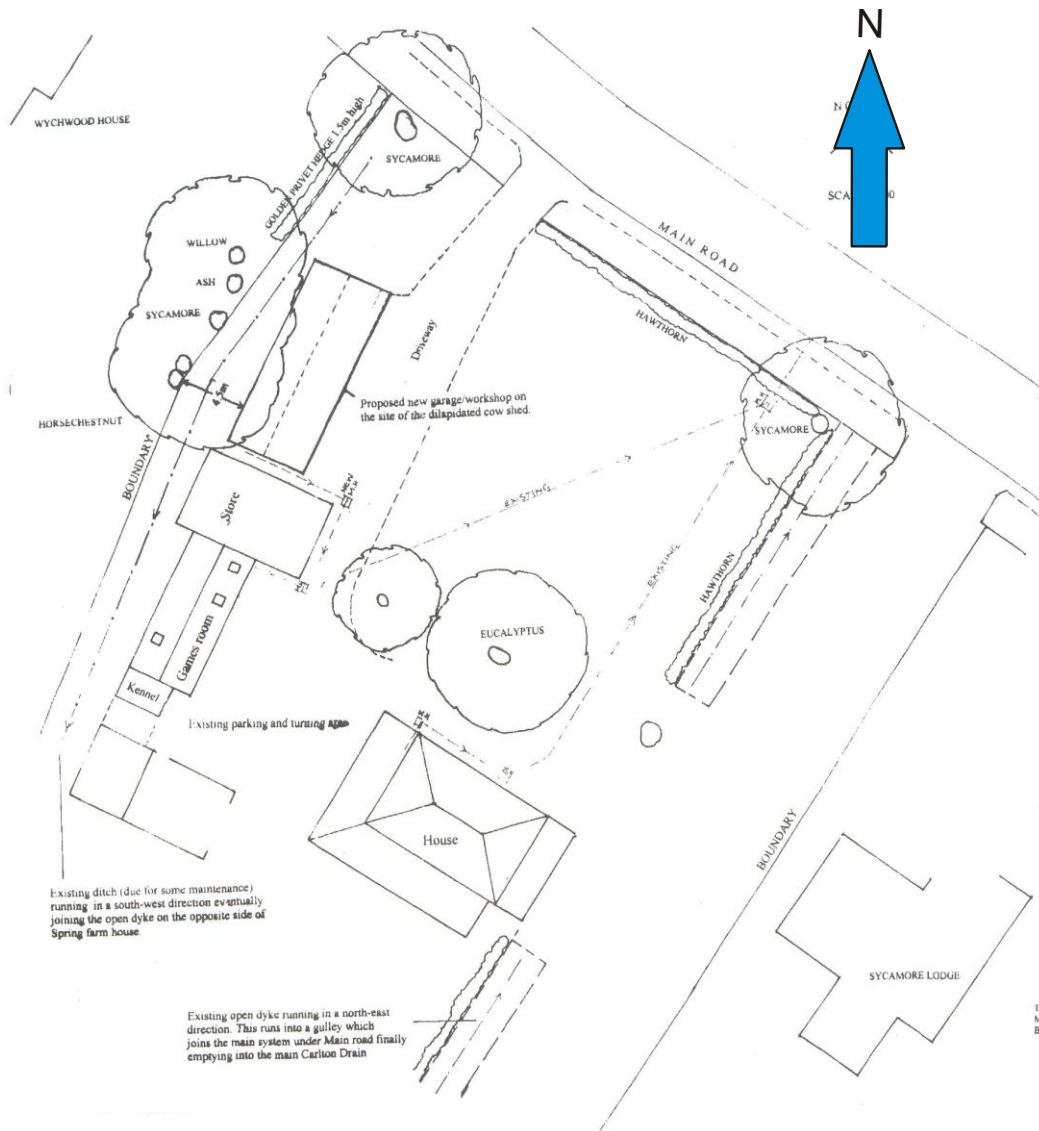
Block plan showing the proposed layout of the development site at an original scale of 1:200, (not to scale).
